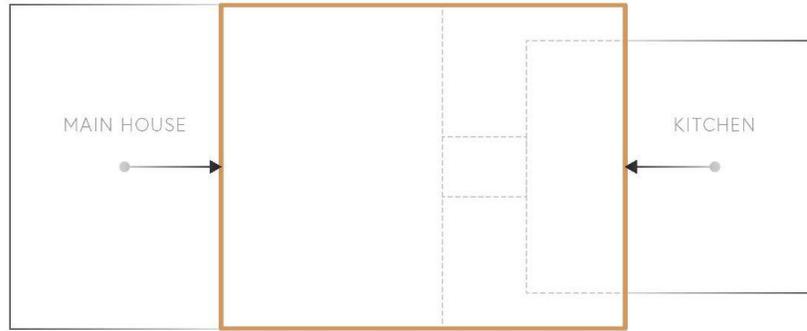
, Proposed Floor Plan: Shape (Source: Author)
